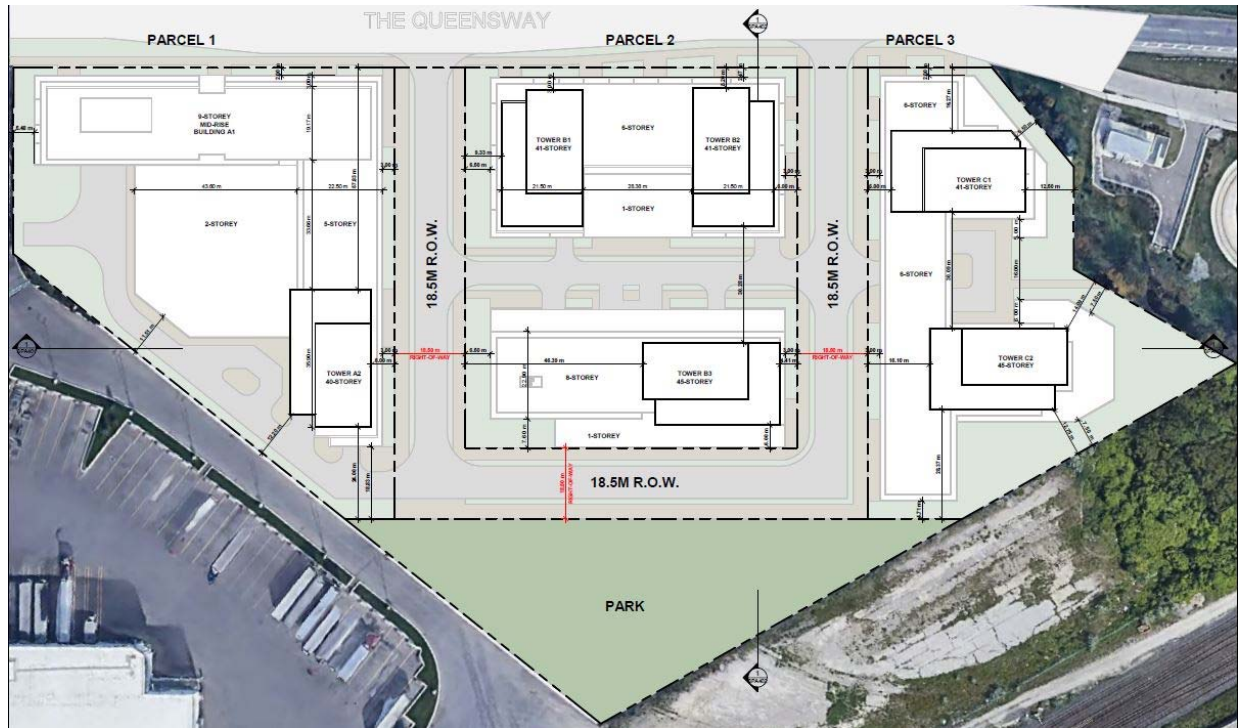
Conceptual Site Plan for Proposed High-Rise Mixed Use Development Site
